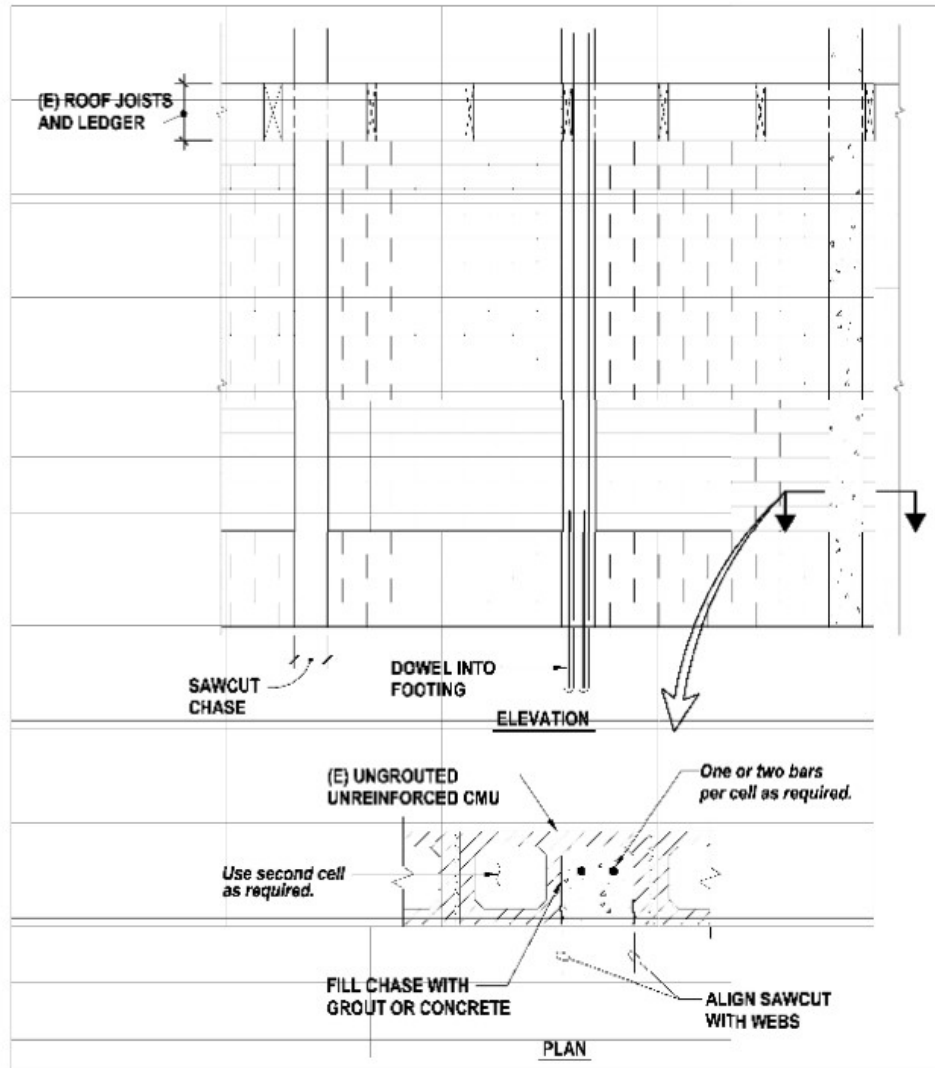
Concrete Ribs in Hollow Masonry
